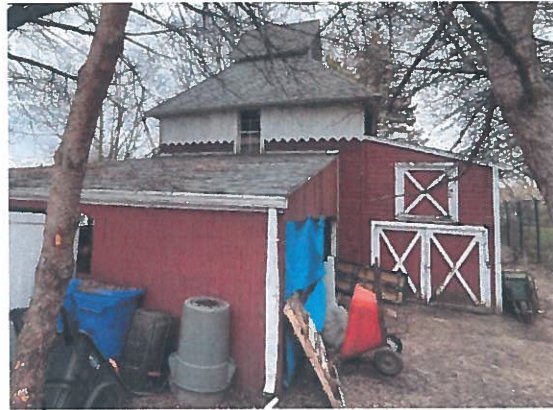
North Elevation. Note the smashed downspout at the lean-to.
